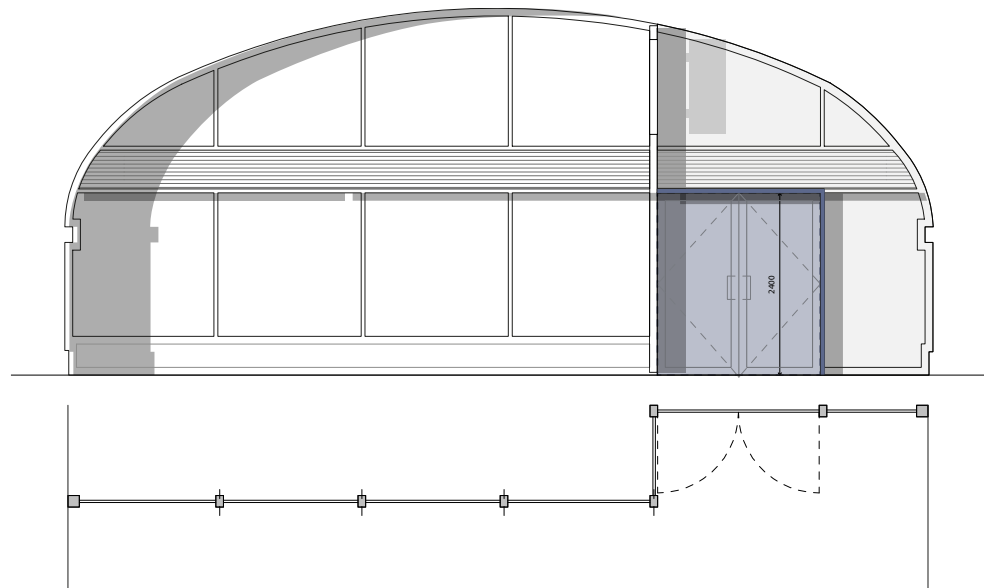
Elevation and plan showing A1 (food business) recessed doorway
